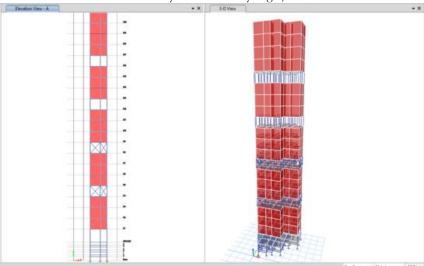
Elevation & 3D view of the building with bracing at 4th+8th floors on 15° sloping ground
